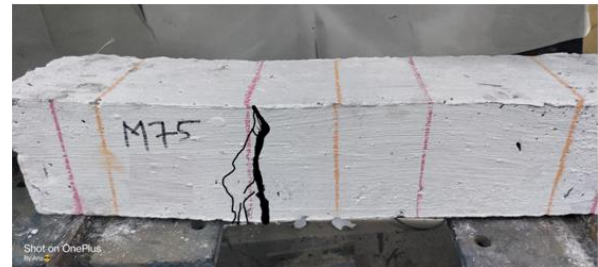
Failure Pattern of M75 Beam Specimen under Cyclic loadings
